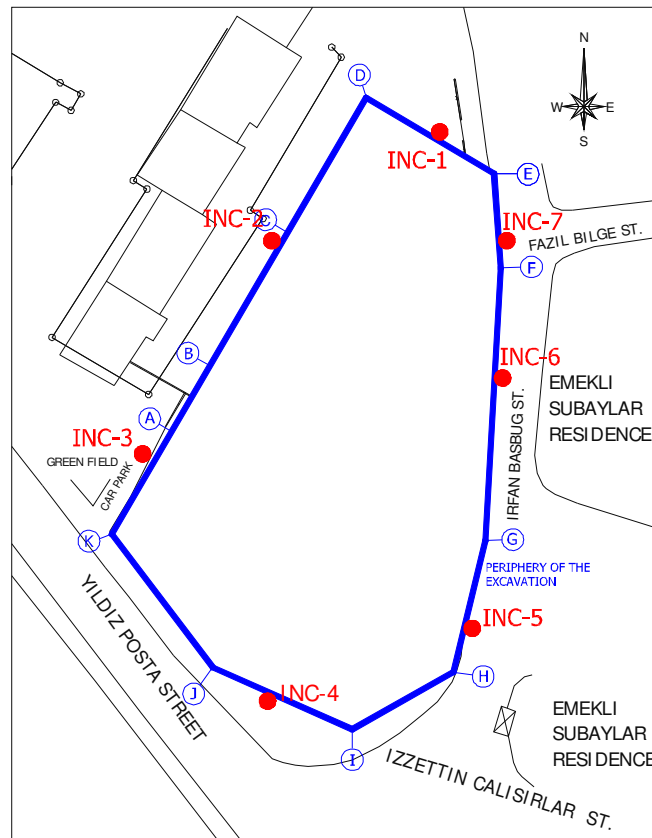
The locations of inclinometer boreholes on the general layout plan of the site.
